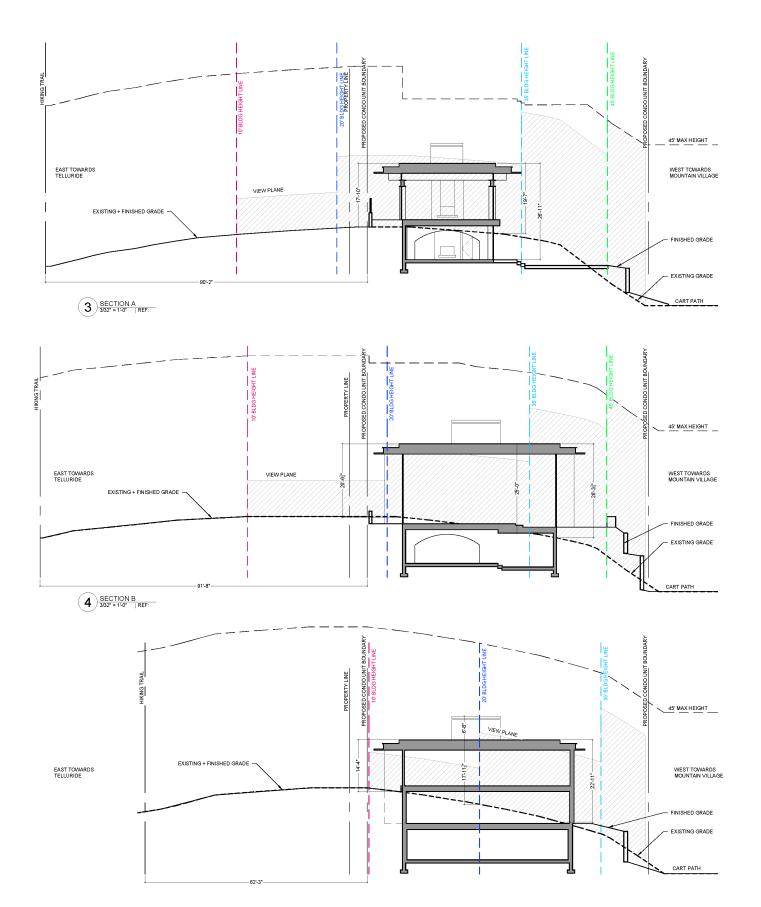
Coonskin View Plan Cross-Sections - Openspace Architecture
